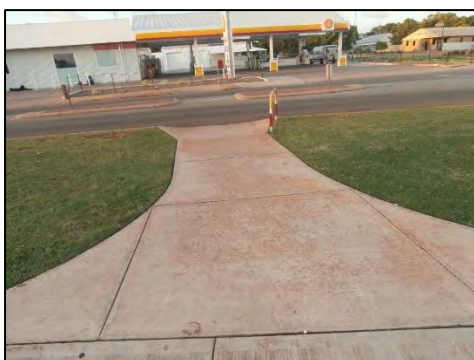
Generally, where provided, kerb ramp upper landings are relatively flat providing a stable base to undertake a change direction, rest or wait for traffic to pass before crossing a roadway. The kerb ramp on the Male Oval Reserve, opposite Shell petrol, has a sloped walkway leading to the top of the kerb ramp, without an upper kerb ramp landing being provided. The U Rail may offer some assistance in this instance.
